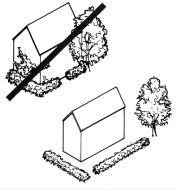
Avoid placing landscape elements too close to the foundation. They can encourage water retention and water damage.
